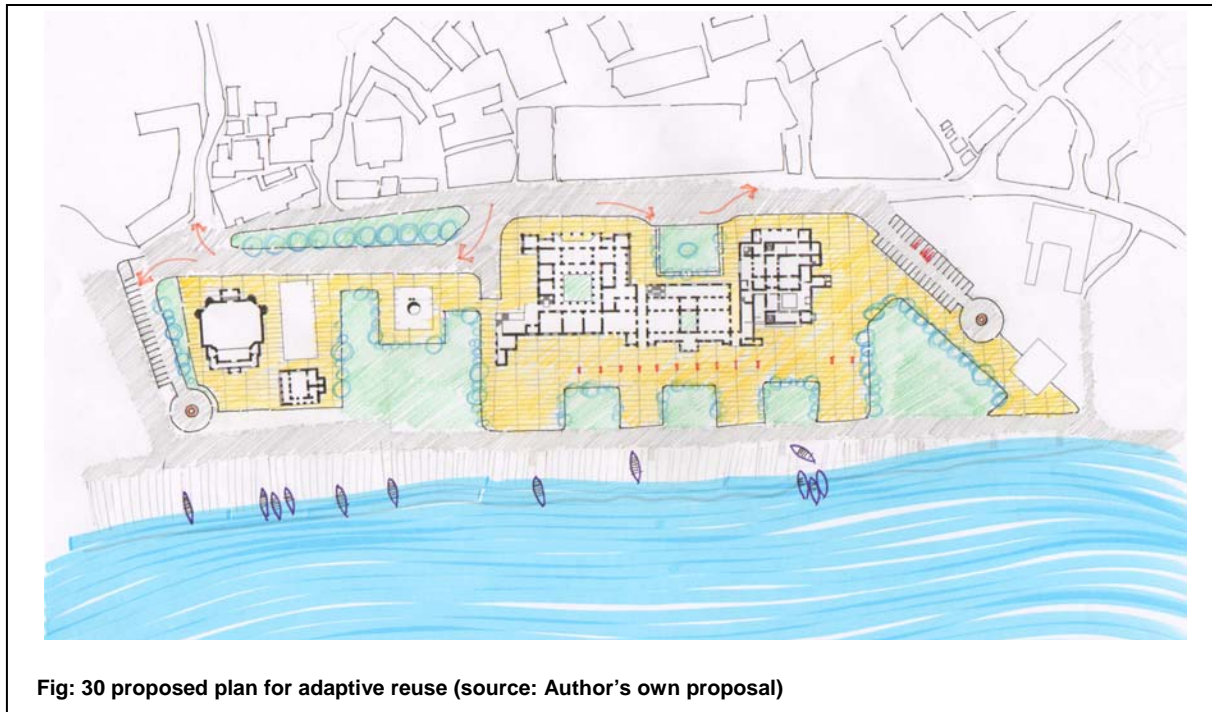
proposed plan for adaptive reuse (source: Author's own proposal)
